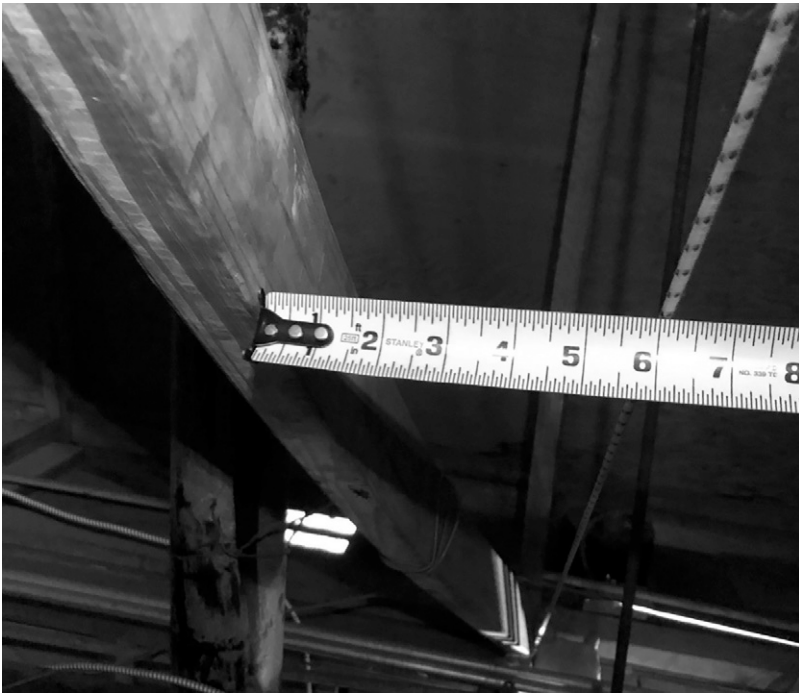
Exemplar web member showing 15.5 cm (6-1/8 inches) of deflection. The member is 2×4 , #2 as called for in the truss diagram. Its unbraced length is 256.5 cm (101 inches). The truss had little or no live loading at the time of the photograph.
